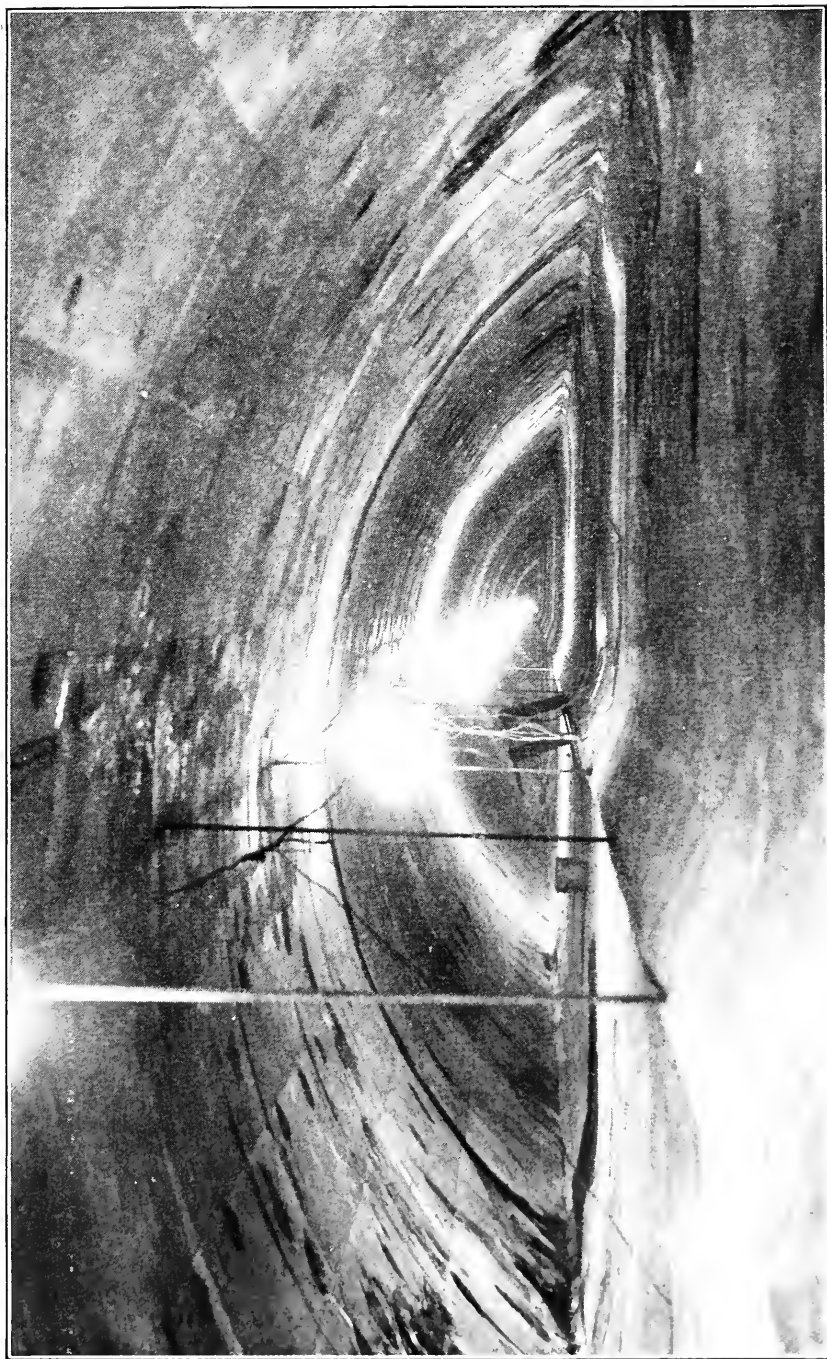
PLATE IV.—EXHAUST AIR DUCT. THE FLOOR OF THE DUCT IS THE TOP OF THE ROOF OVER THE ROADWAY.
